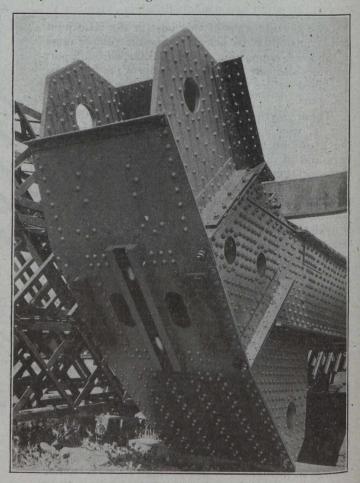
Upper Section of Bearings Riveted to Bottom of XL0 Joint
